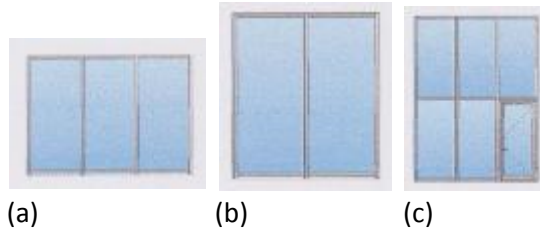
Modular glazed elements - (a) Hall Façade and Gym (b) Offices and Classrooms (c) Hall entrance and glazed doors
